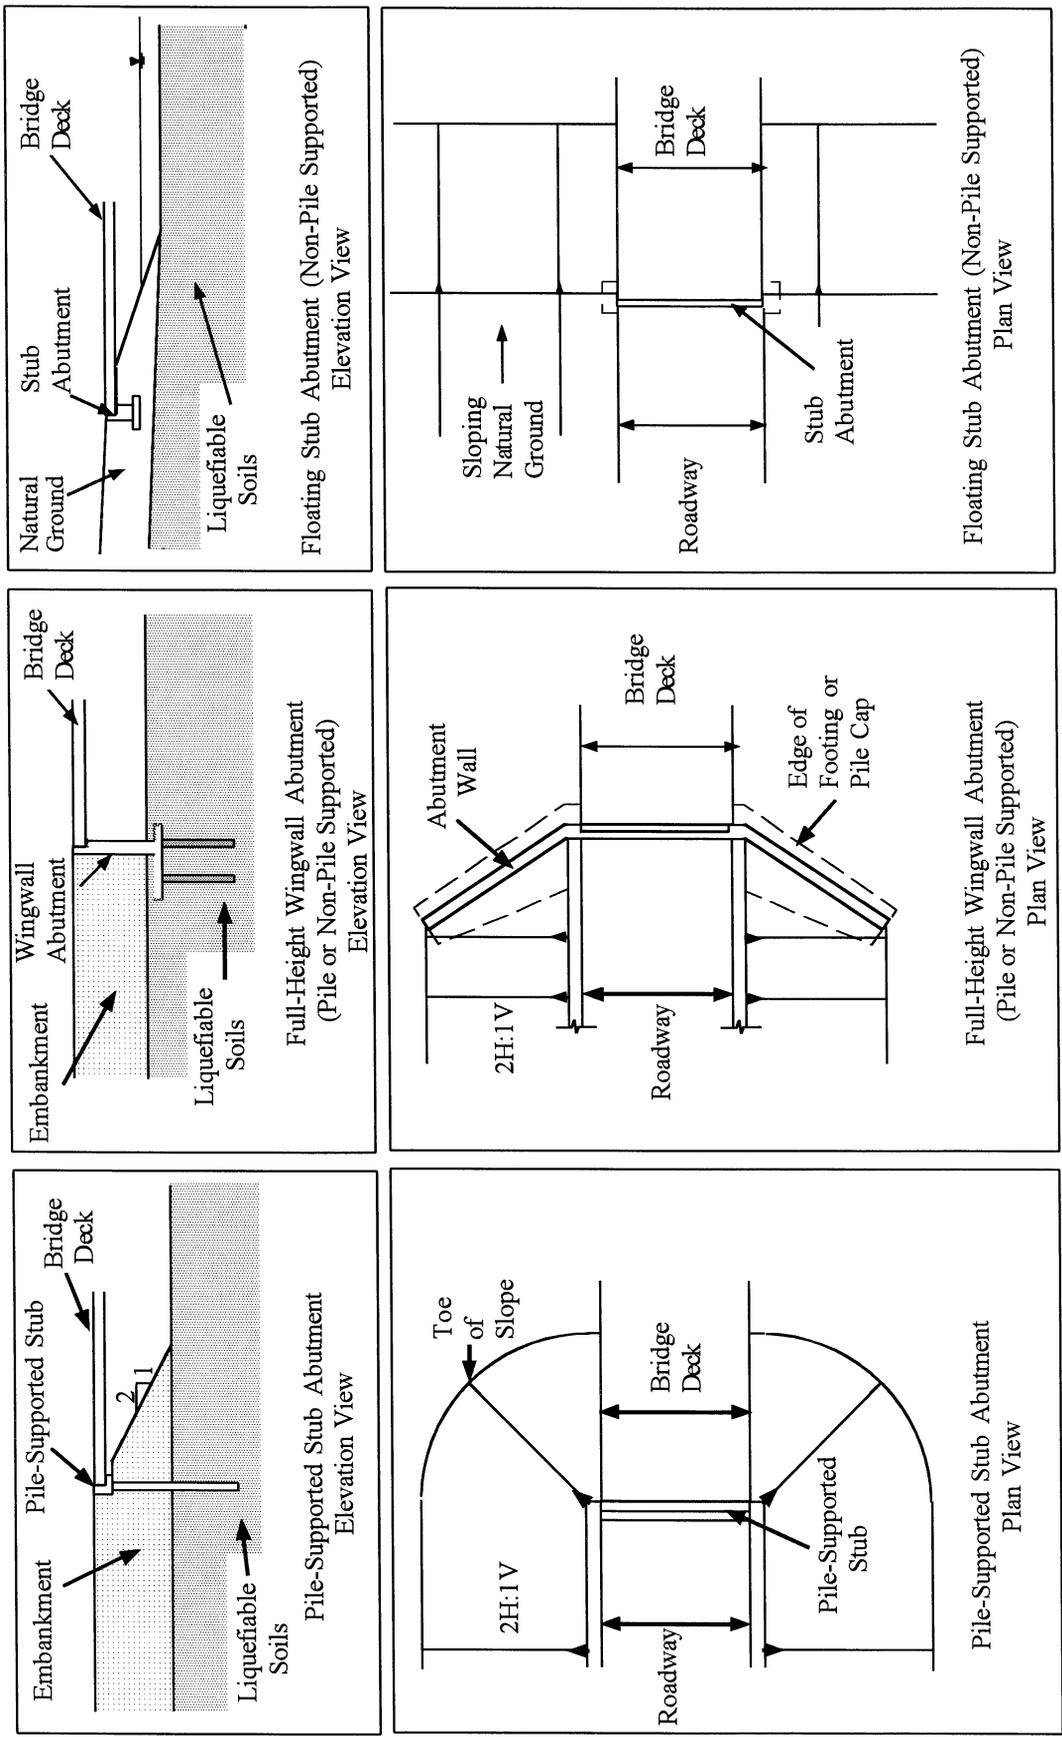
Some Typical Bridge Abutments (from Mitchell and Cooke, 1995)
